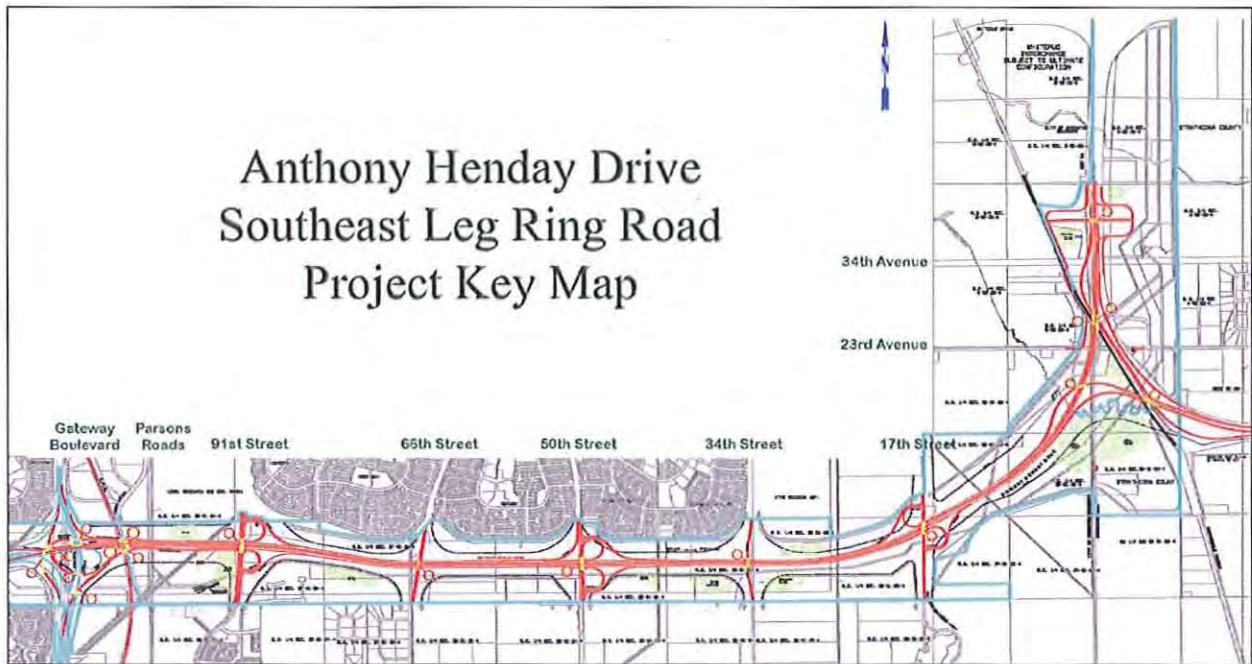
Anthony Henday Drive Southeast Leg Ring Road Project Location
